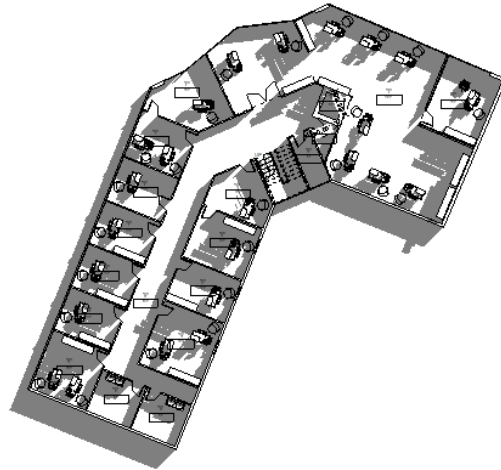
Hagbes 3rd - 6th floor typical floor plan
